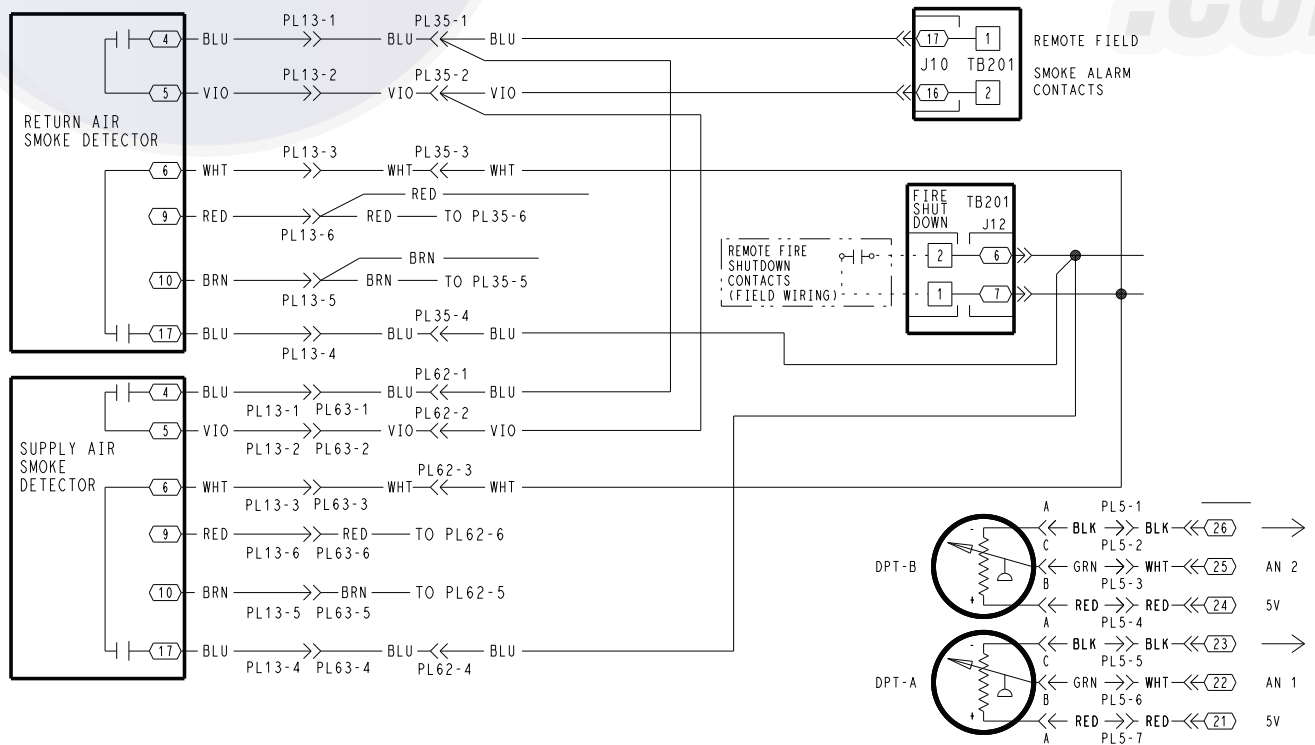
Return/Supply Air Smoke Detector Wiring
